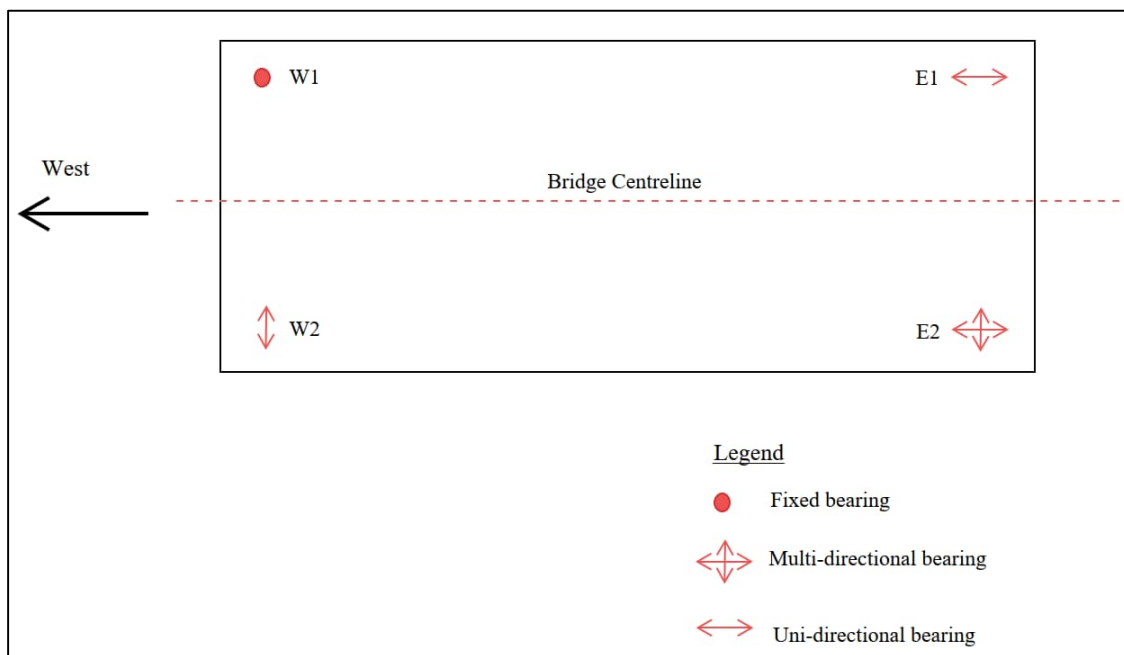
Plan view of the Ashton Bridge illustrating the bearing layout and articulation
